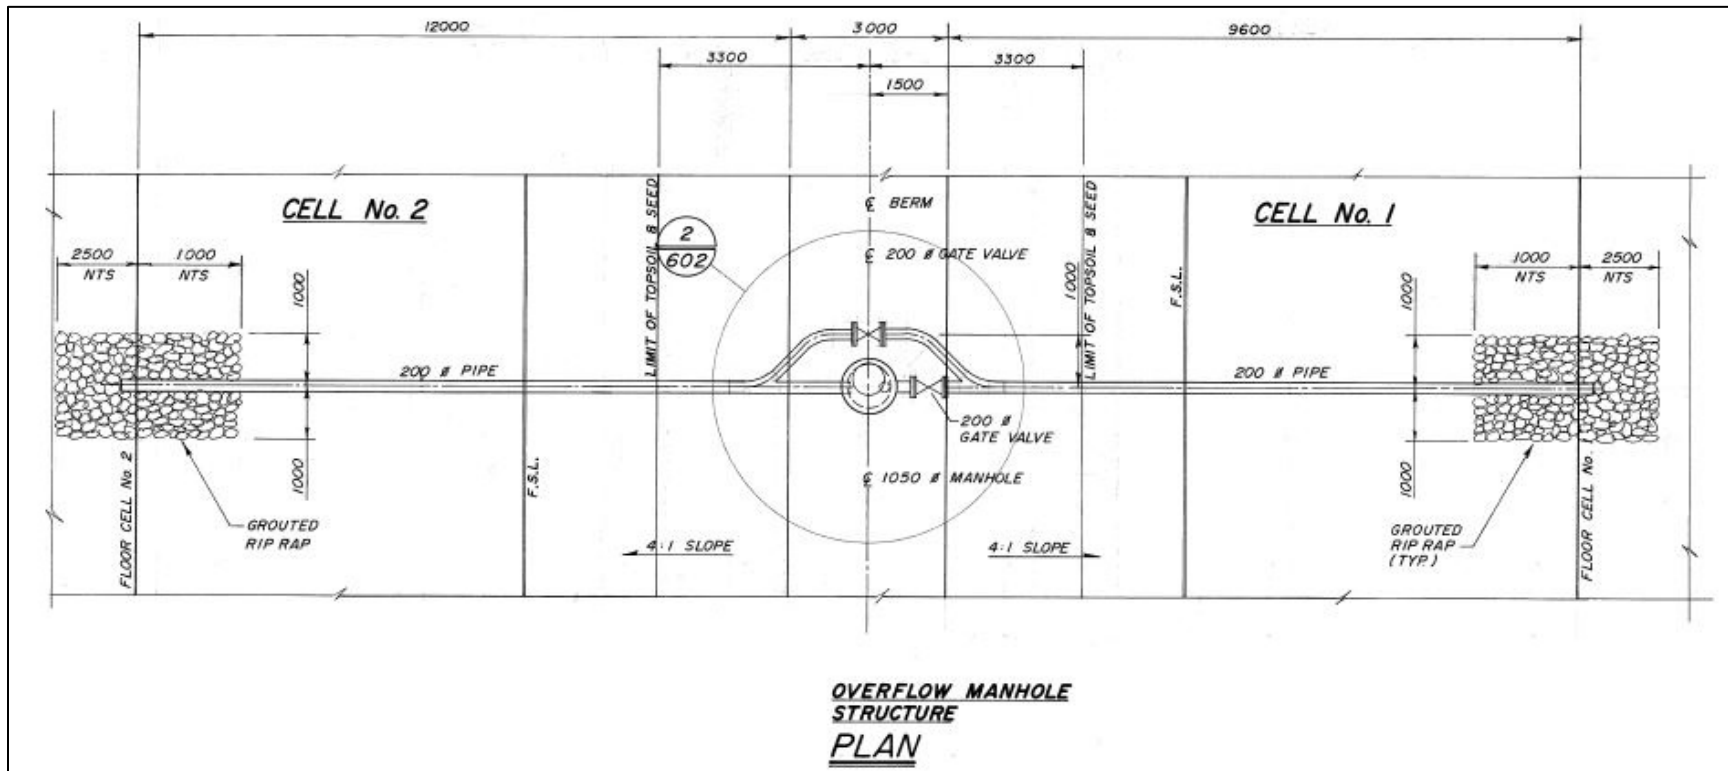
1988 Construction drawing - Plan view of overflow manhole structure (Modified from Bullée Consulting Ltd. 1988b)
